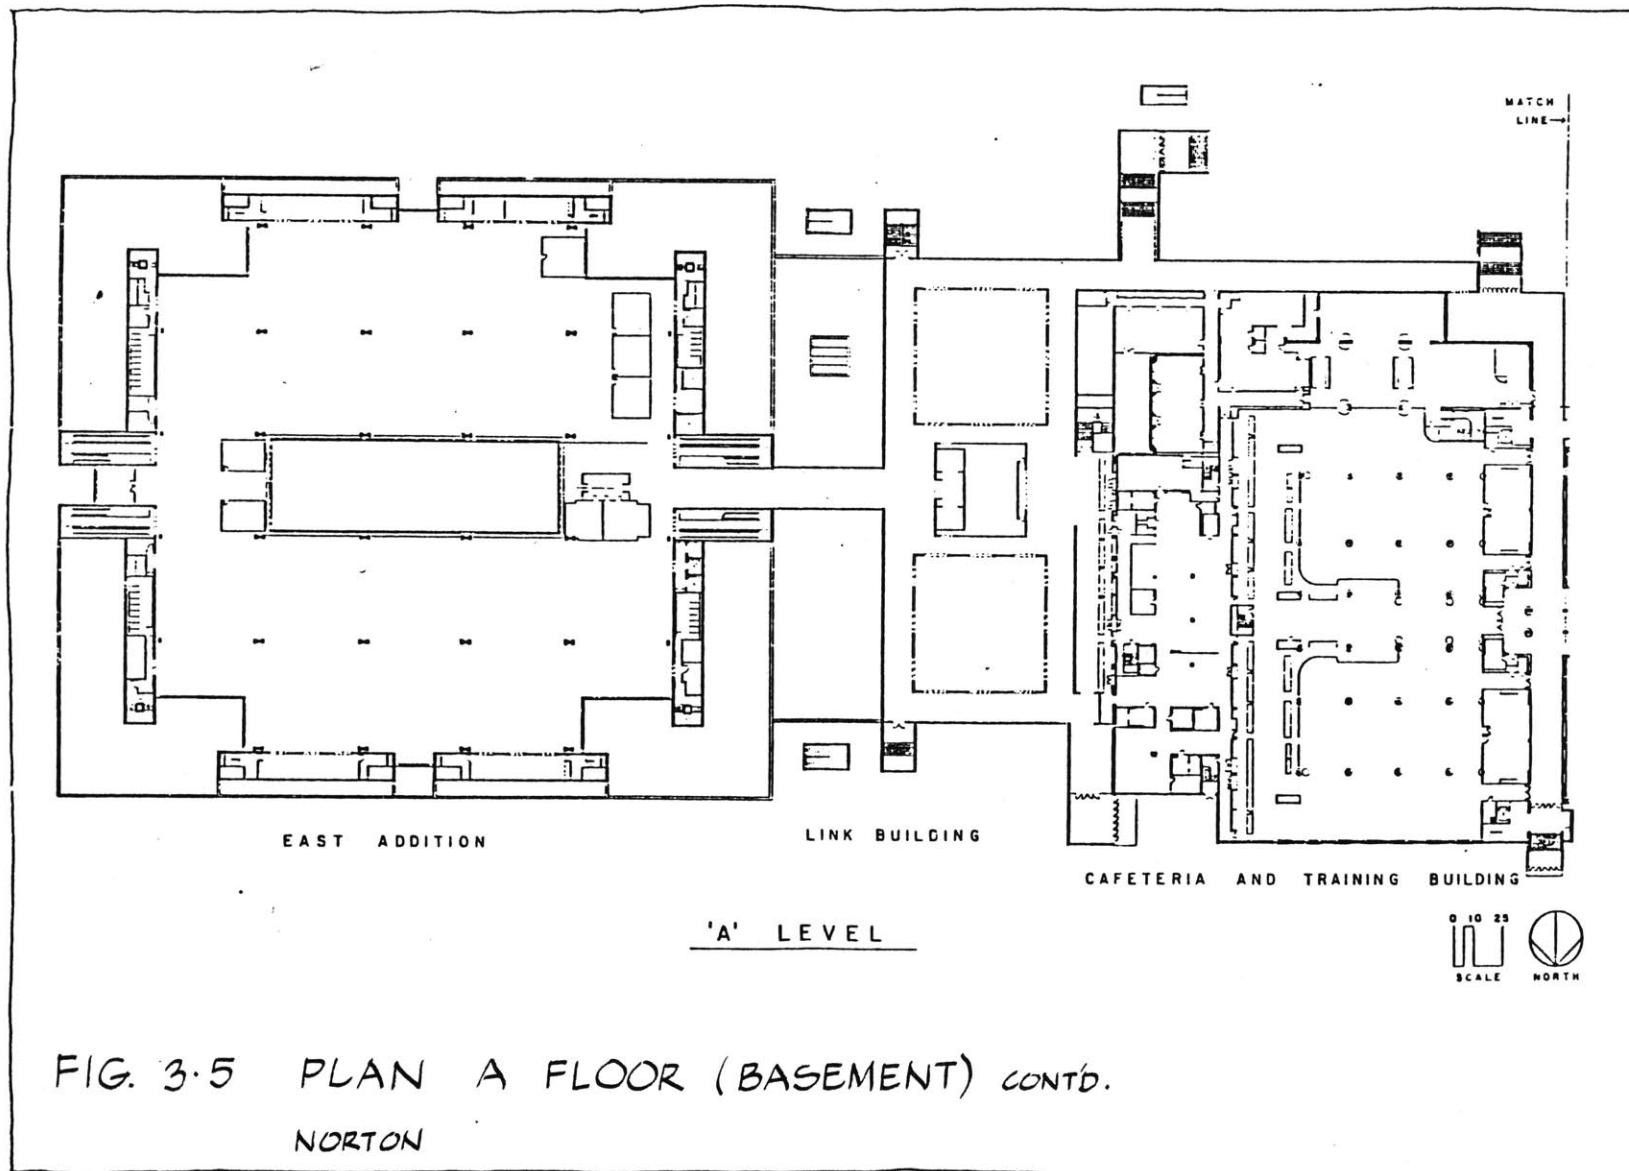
PLAN A FLOOR (BASEMENT) CONT'D.
